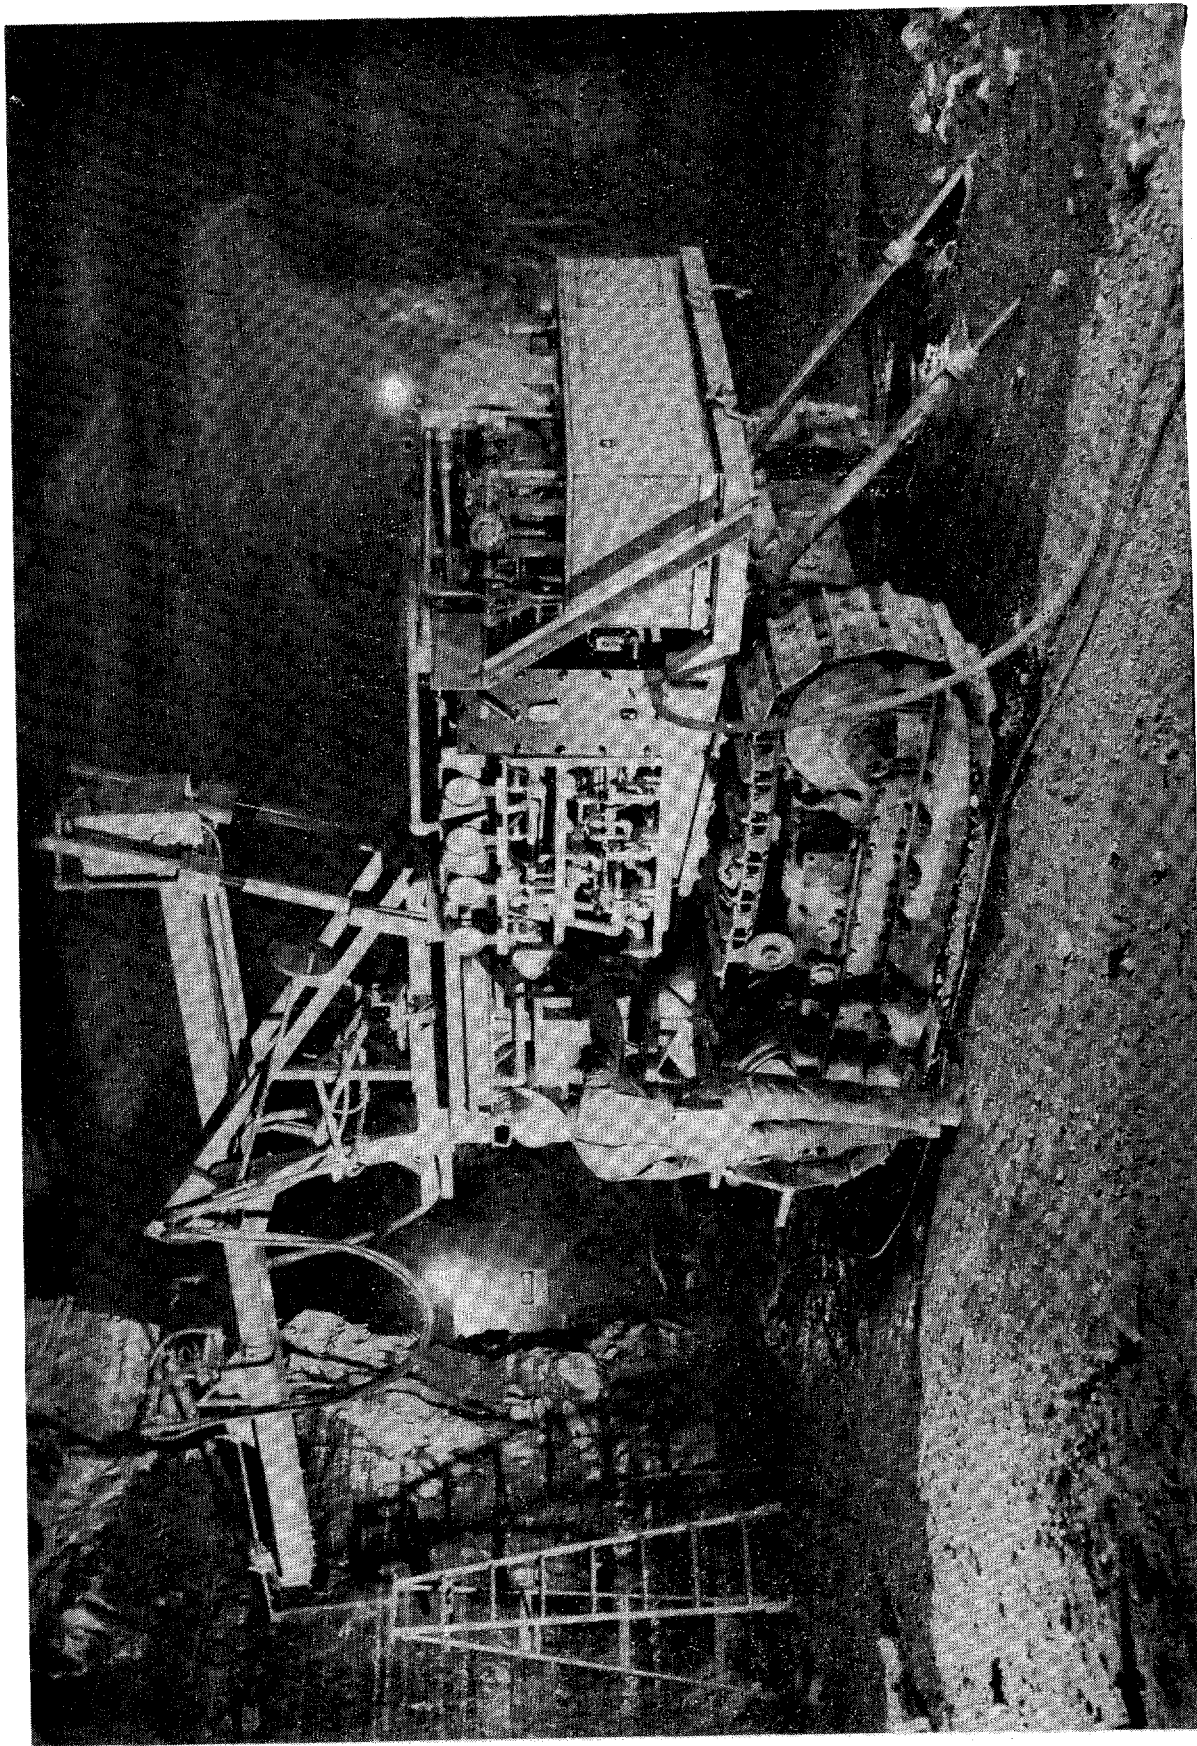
Hydraulic rotary-test-drill unit positioned for drilling horizontal holes.
